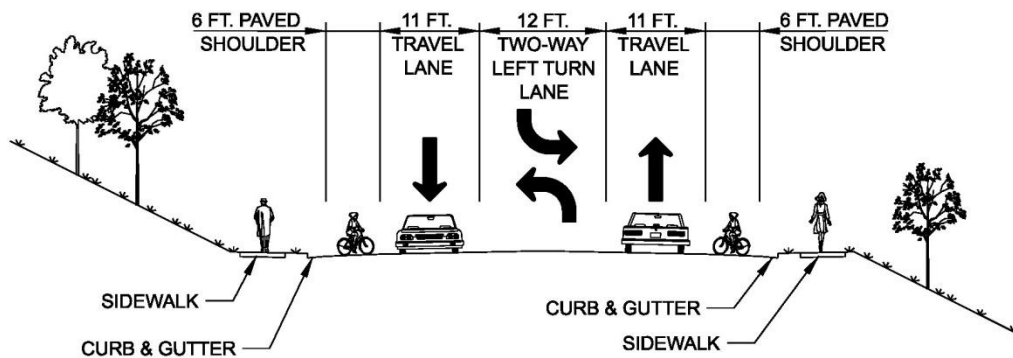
SEGMENT 4 PROPOSED TYPICAL SECTION
